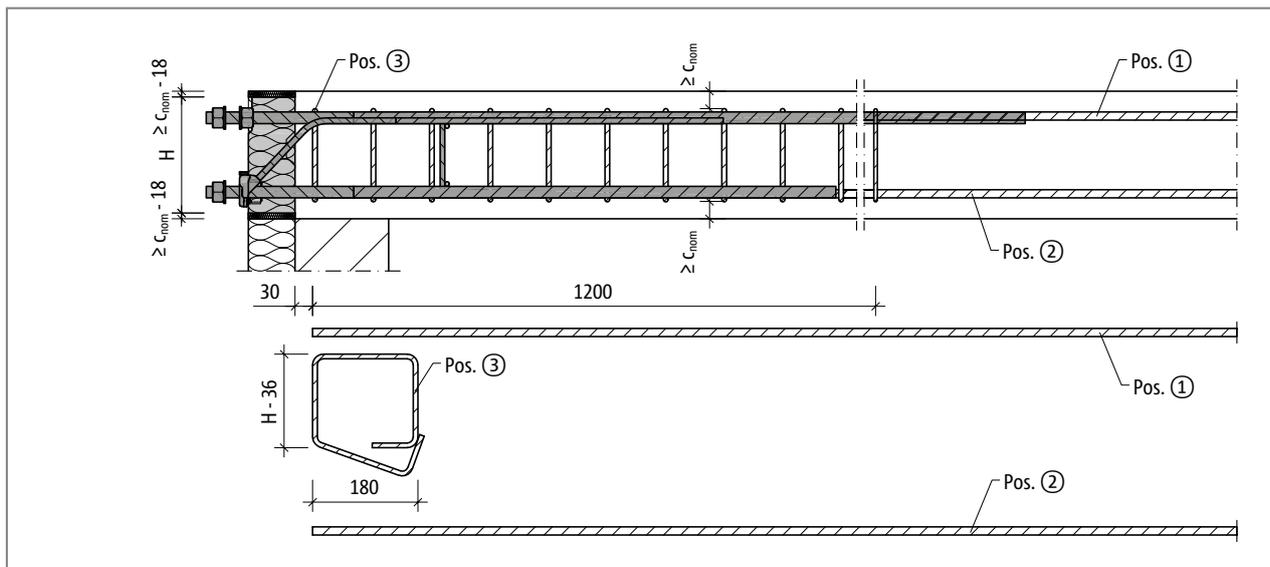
Schöck Isokorb® T type SK-MM2: On-site reinforcement with stirrup \varnothing 8 mm; section
